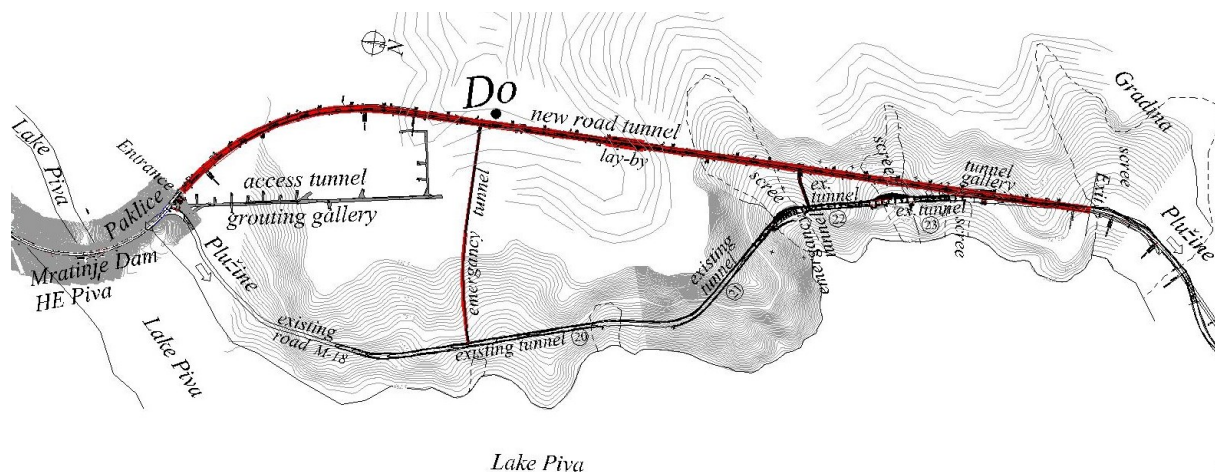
Layout plan of the new tunnel located after Mratinje dam
